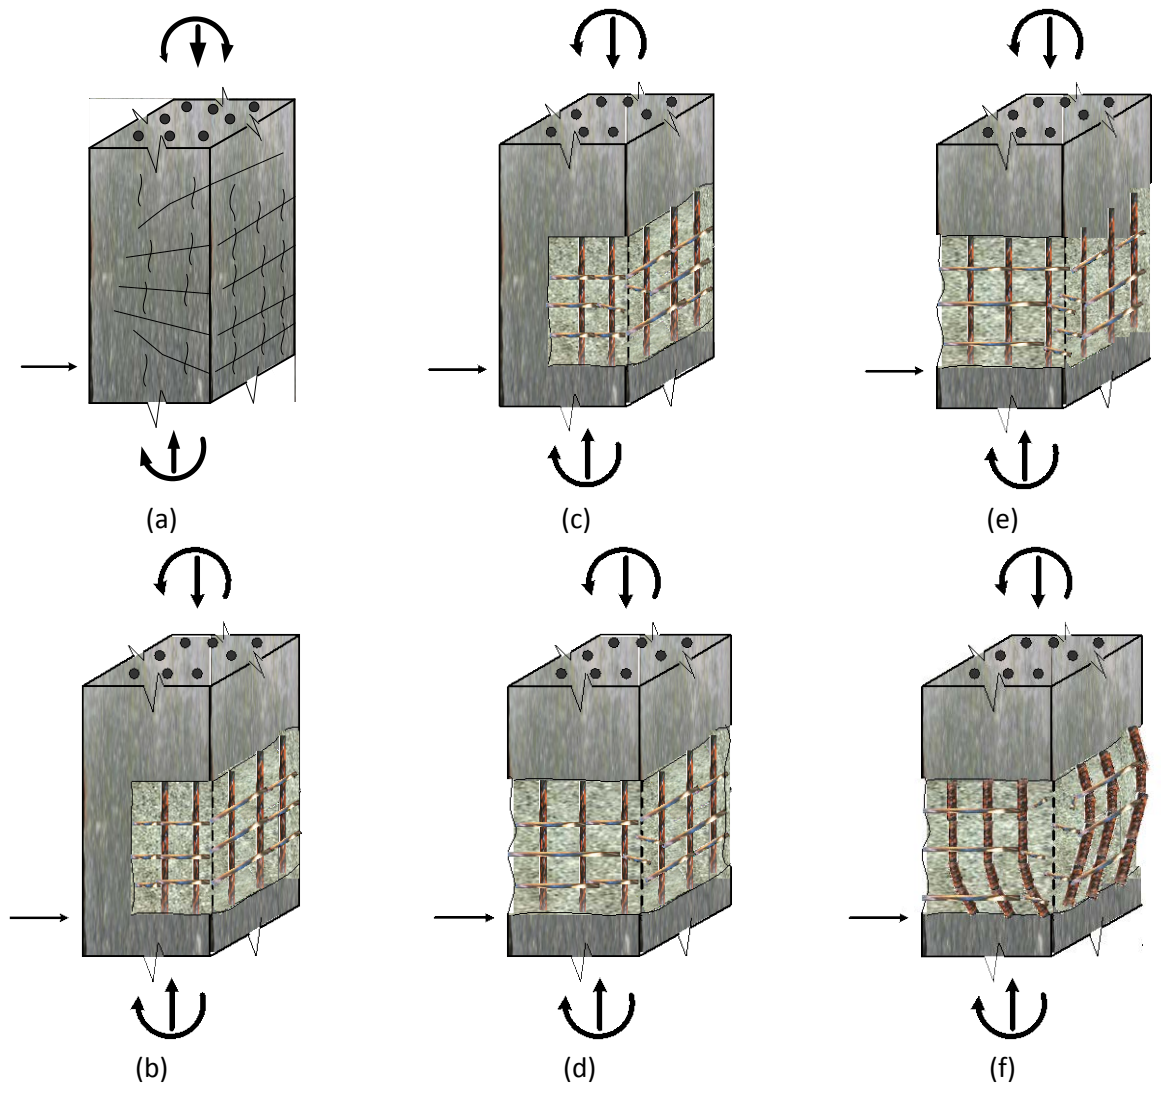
Possible damage and failure modes of RC columns due to combined gravity loads, lateral loads and reinforcement corrosion; (a) flexural and corrosion cracks; (b) initial spalling; (c) one stirrup failure; (d) spalling on all sides; (e) two stirrups failure; (f) loss of confinement and possible buckling.
